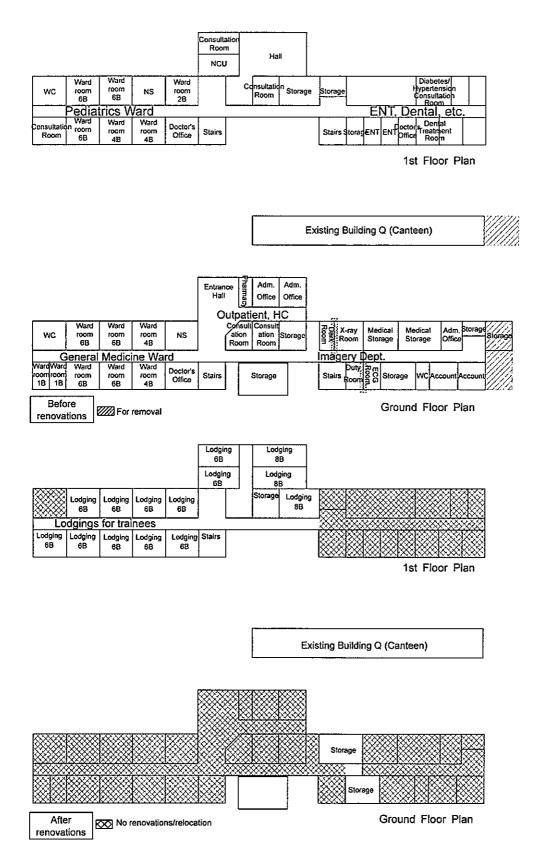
Post-Project Renovation and Relocation Plan for Existing Building B
